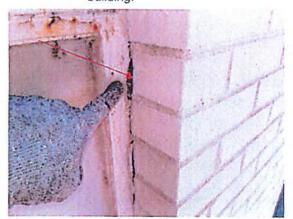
View of exterior door caulking (HA-H) on exterior windows throughout.
